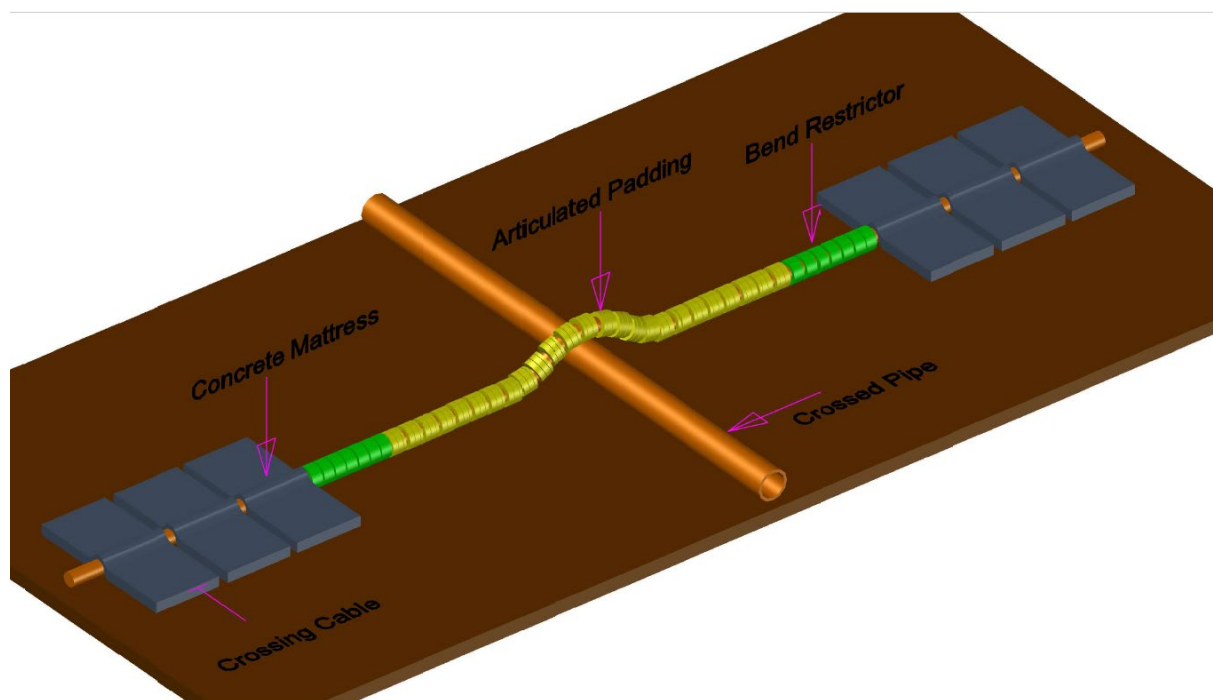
Schematic showing the general arrangement of the articulated padding crossing system.
